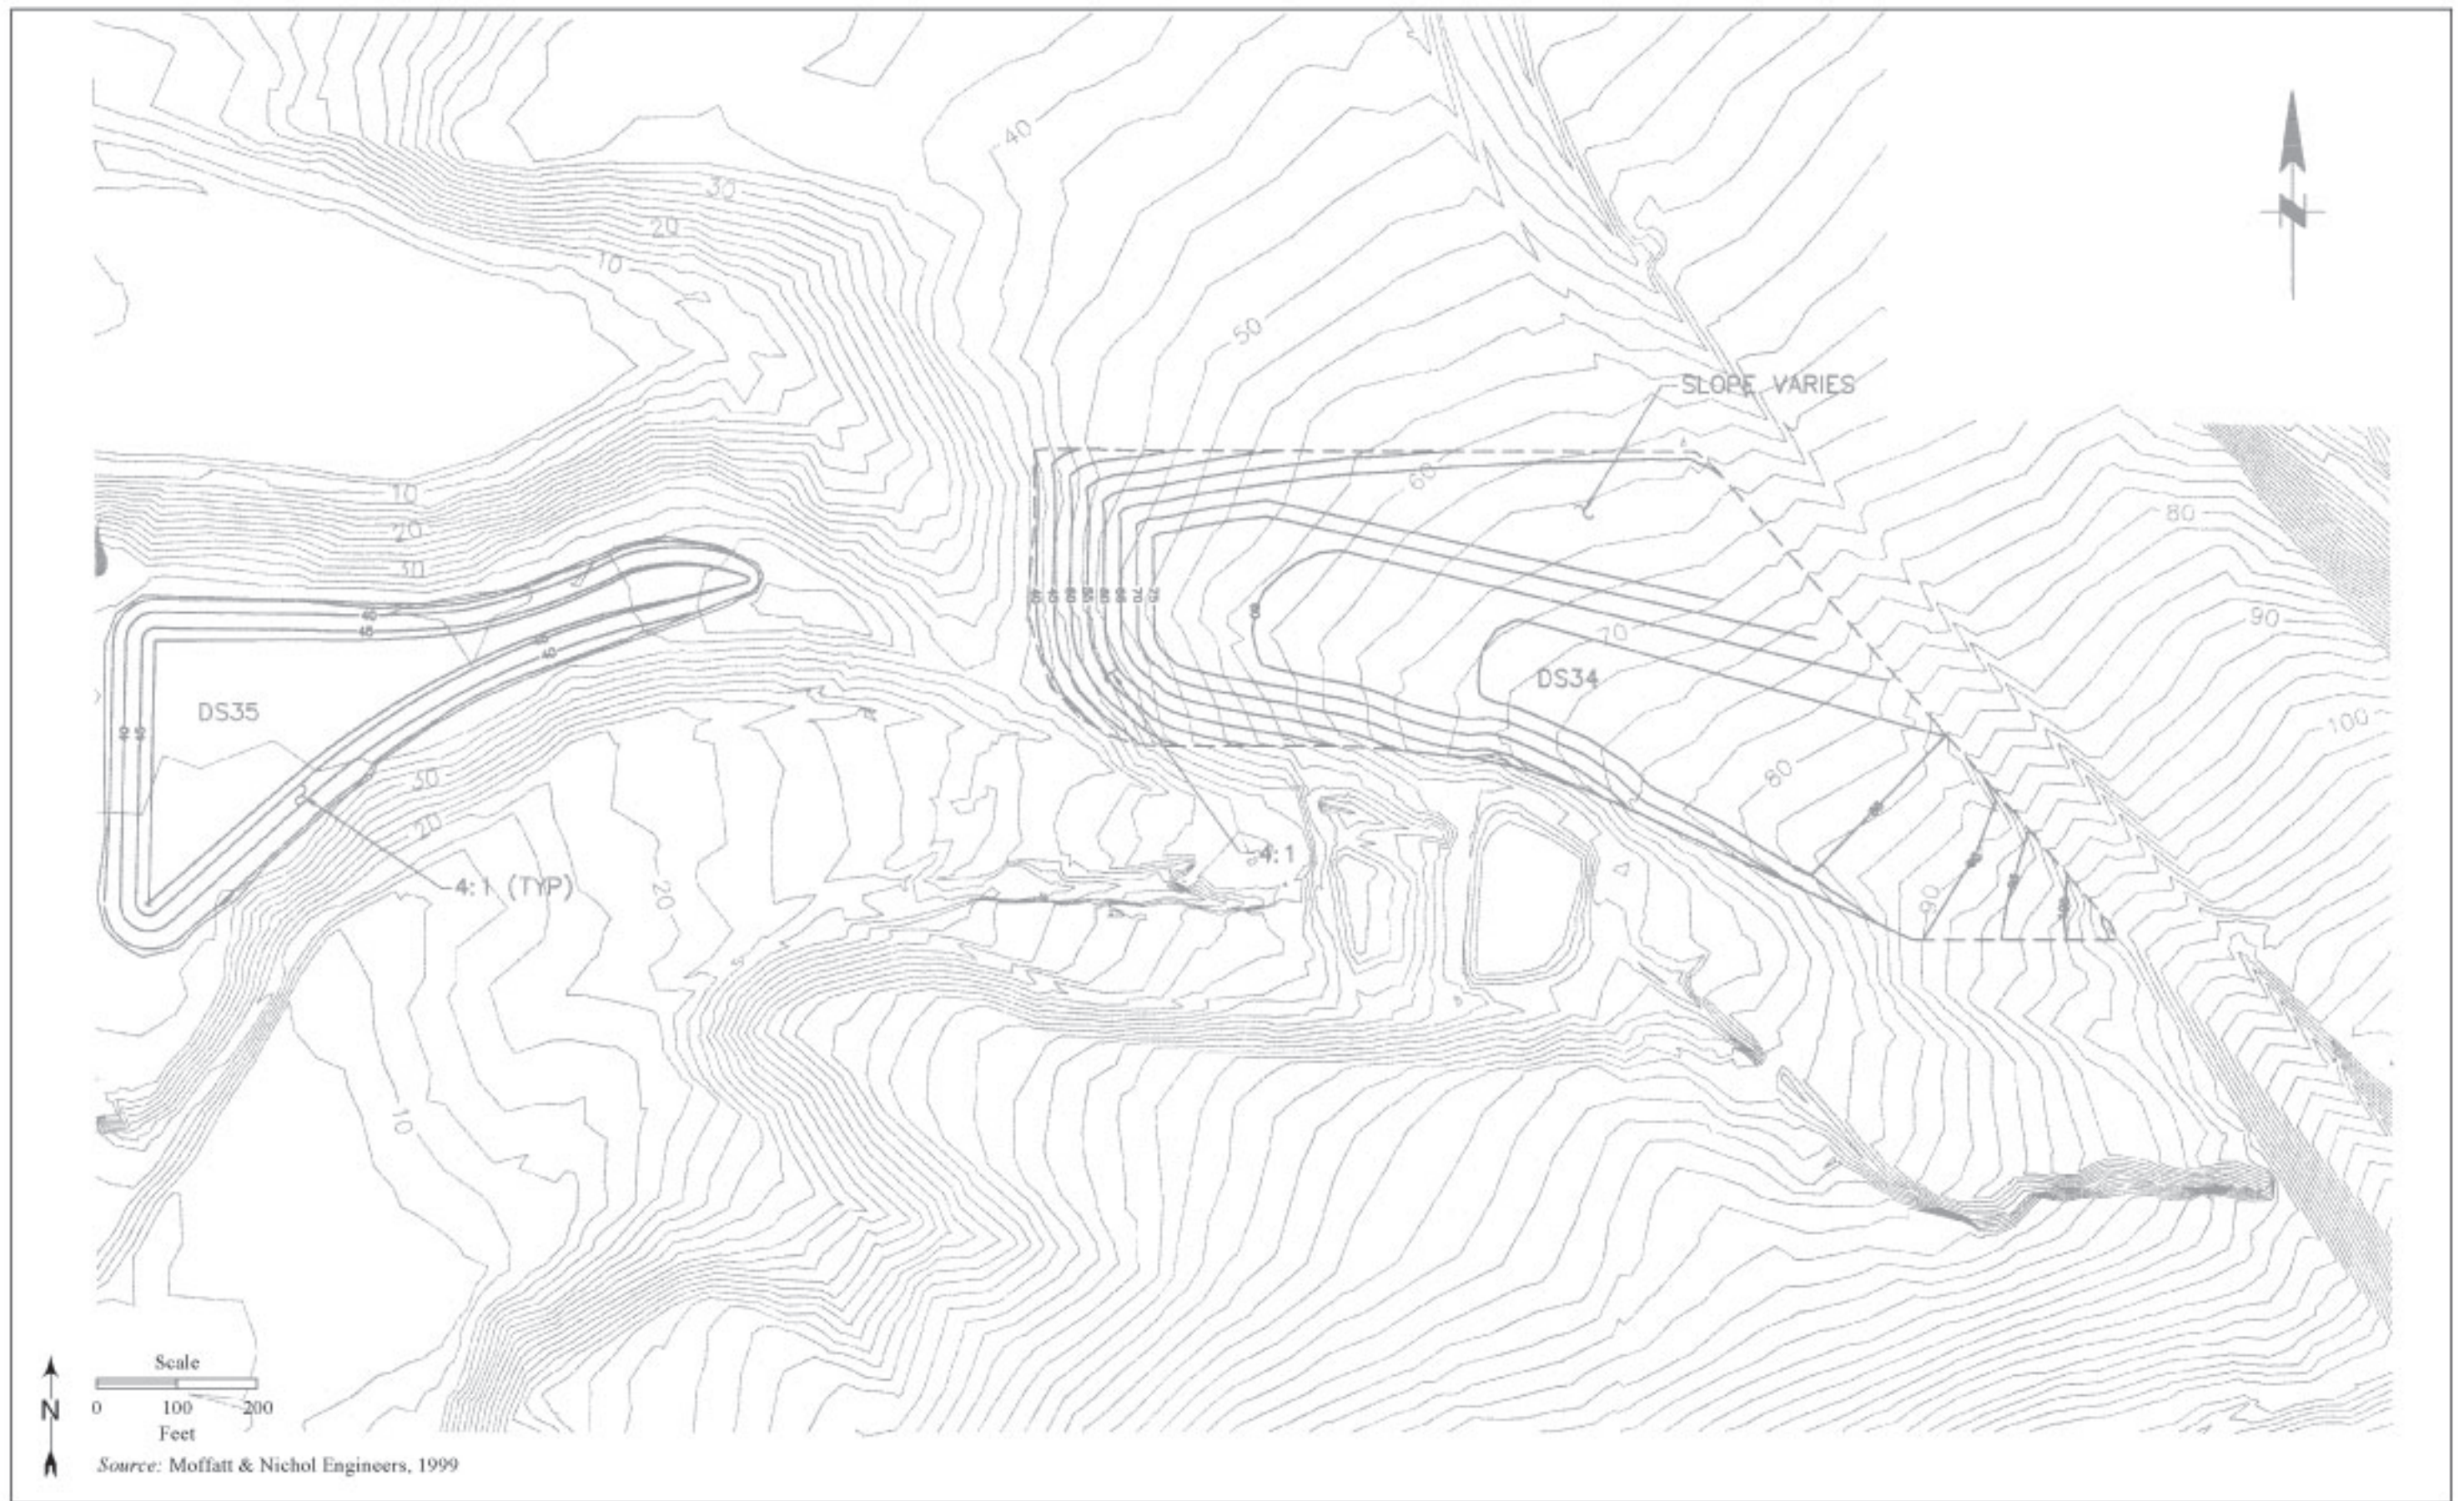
Disposal Site DS34 and DS35 Grading Plans
